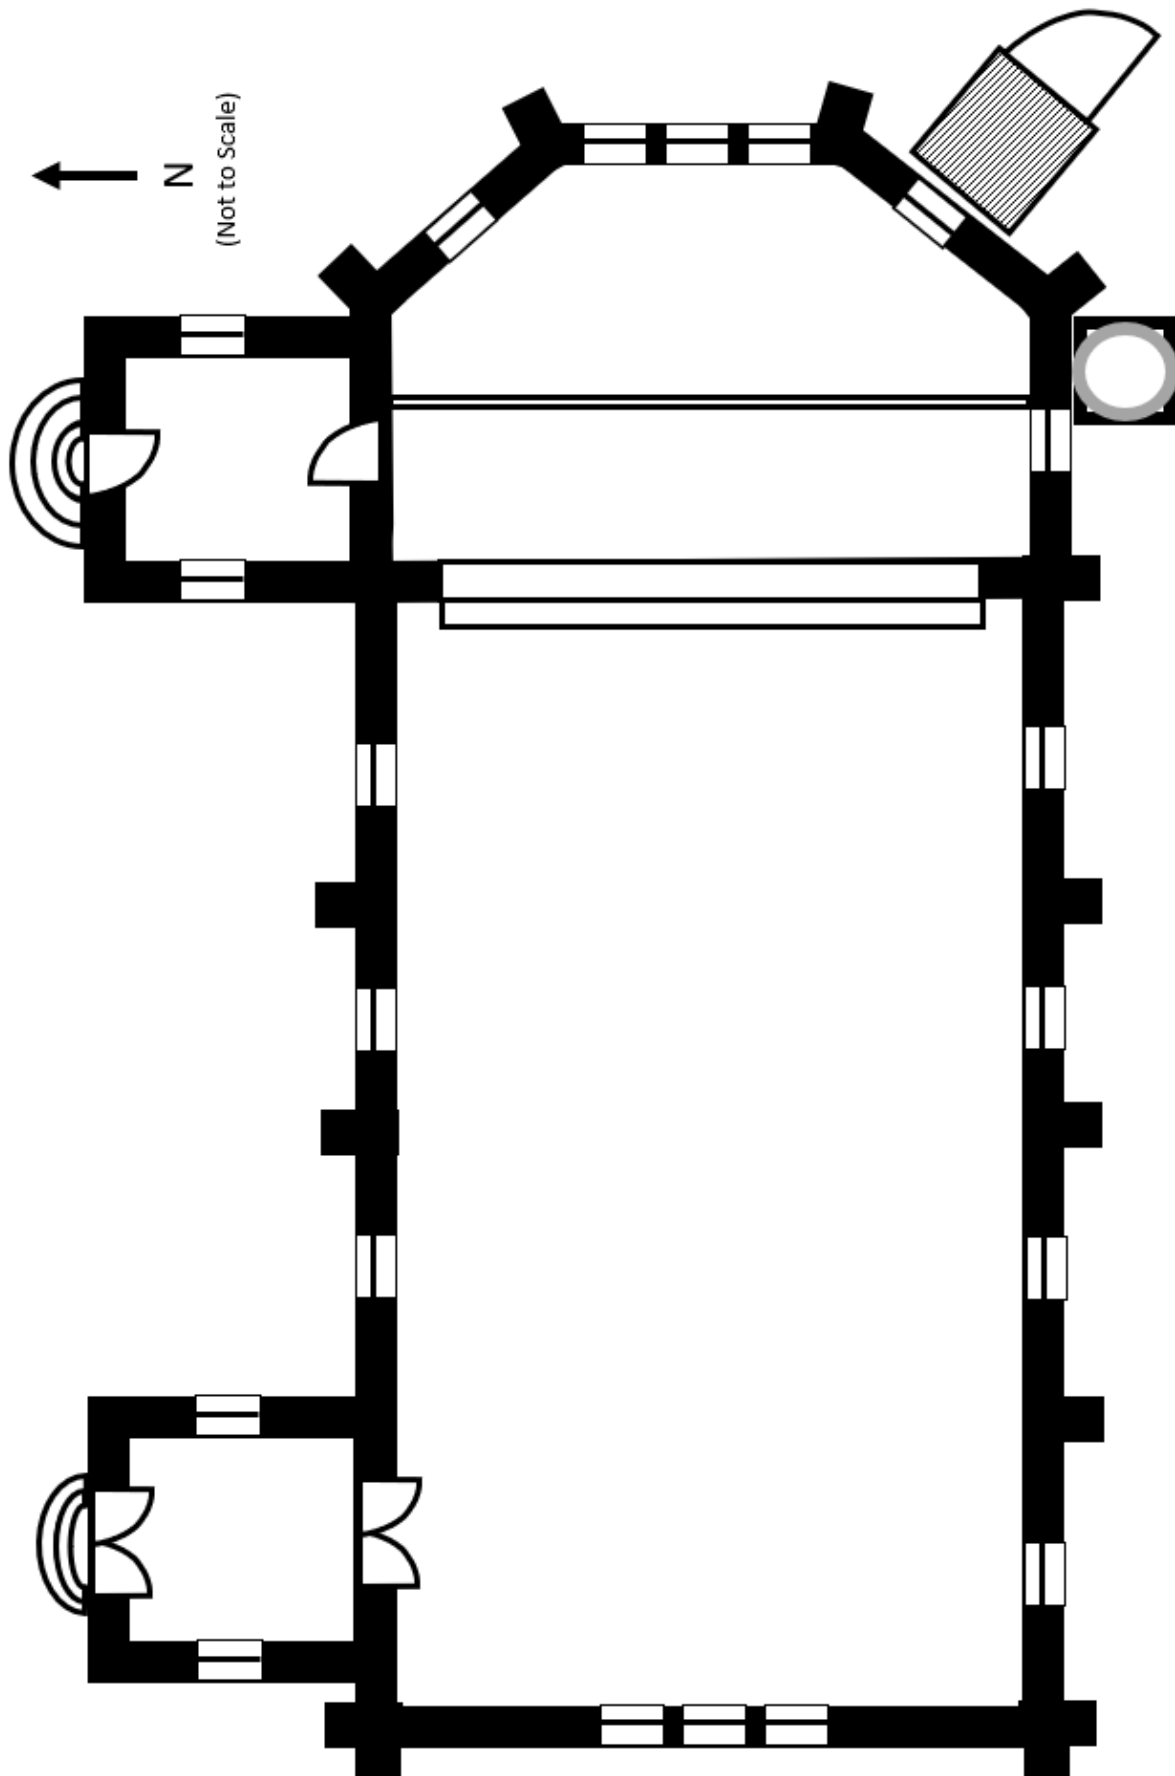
Schematic diagram of the layout of St Luke's Anglican Church Wollar. Please note that this is not to scale (source: Niche, with reference to Broadley 2009).
